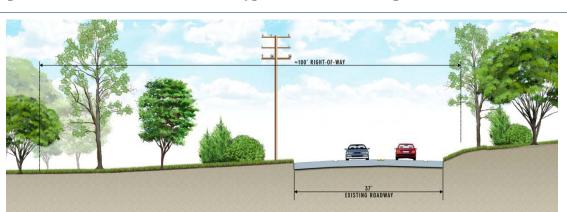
Alternate 1 - No-Build Typical Section Looking East
